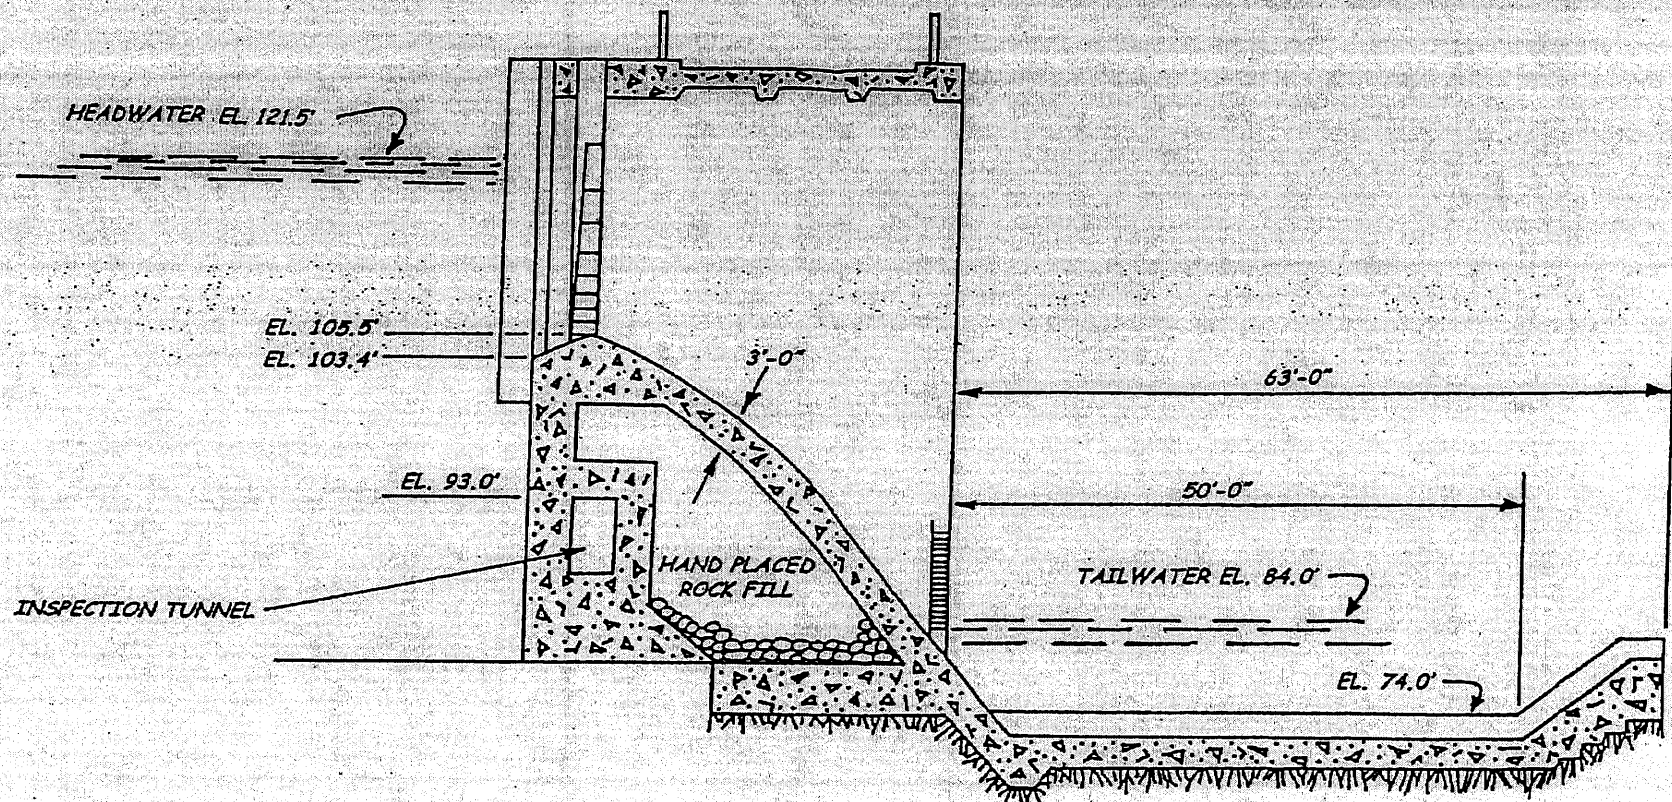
CROSS-SECTIONS OF DAM
